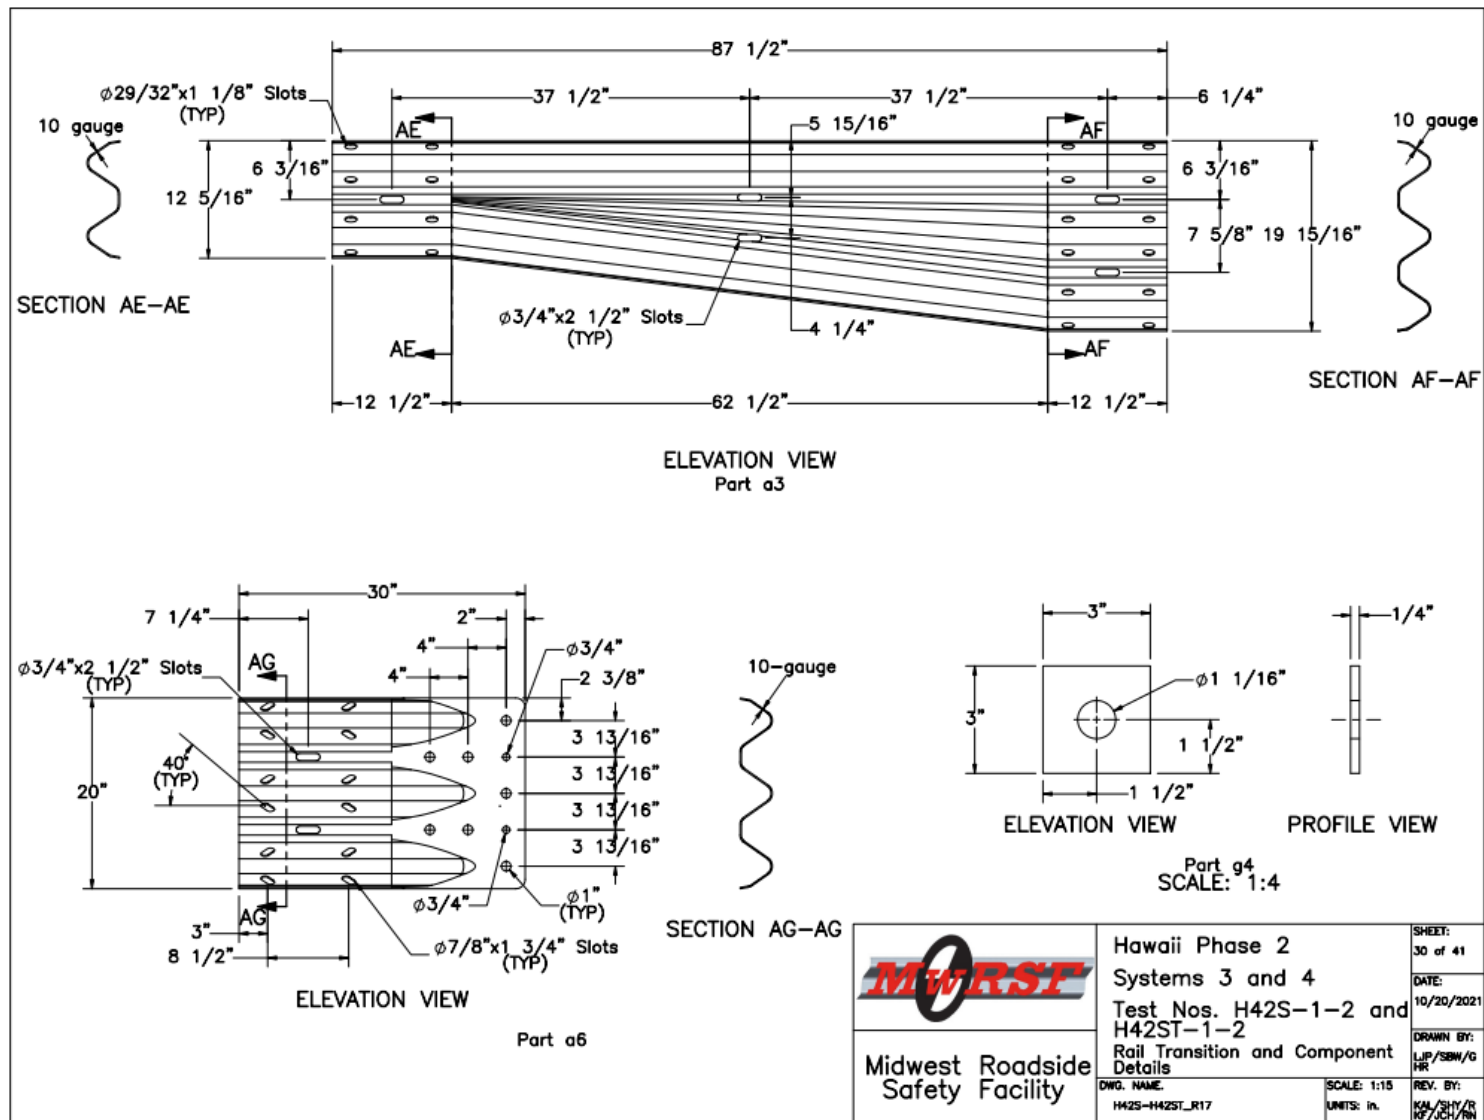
Rail Transition and Component Details, Test Nos. H42ST-1 and H42ST-2
